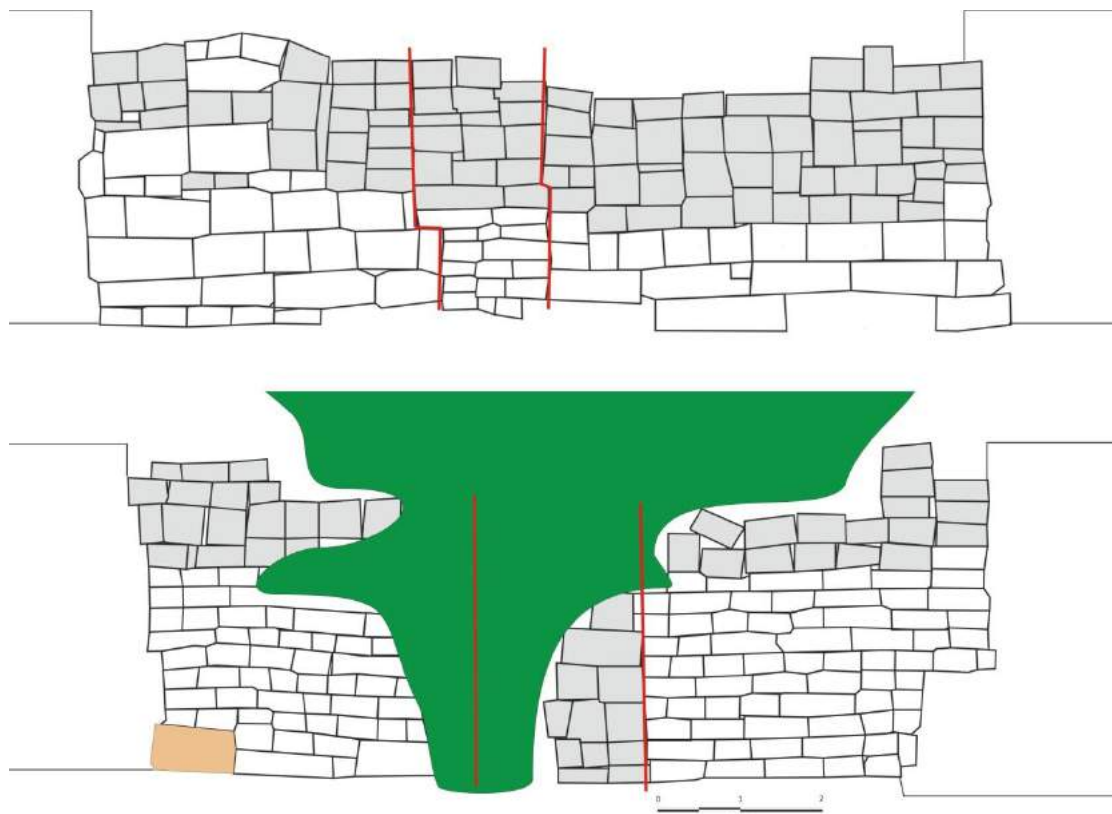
Masonry pattern of the Western gateways in the North wall (above) and the South wall (below) showing sandstone (grey) and laterite (white); foliage (green) and termite mound (beige)
